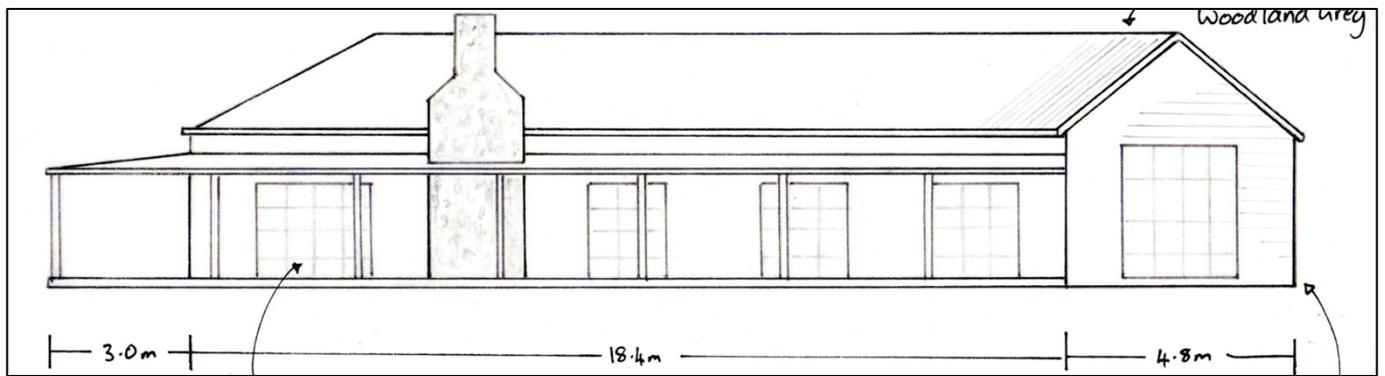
Proposed Eastern Elevation Plan (dwelling).
